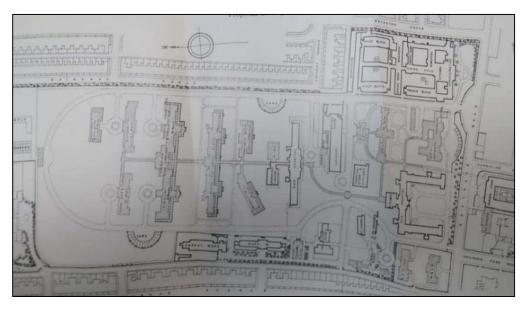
Plan of General Hospital 1936. Westgate Road to the right
